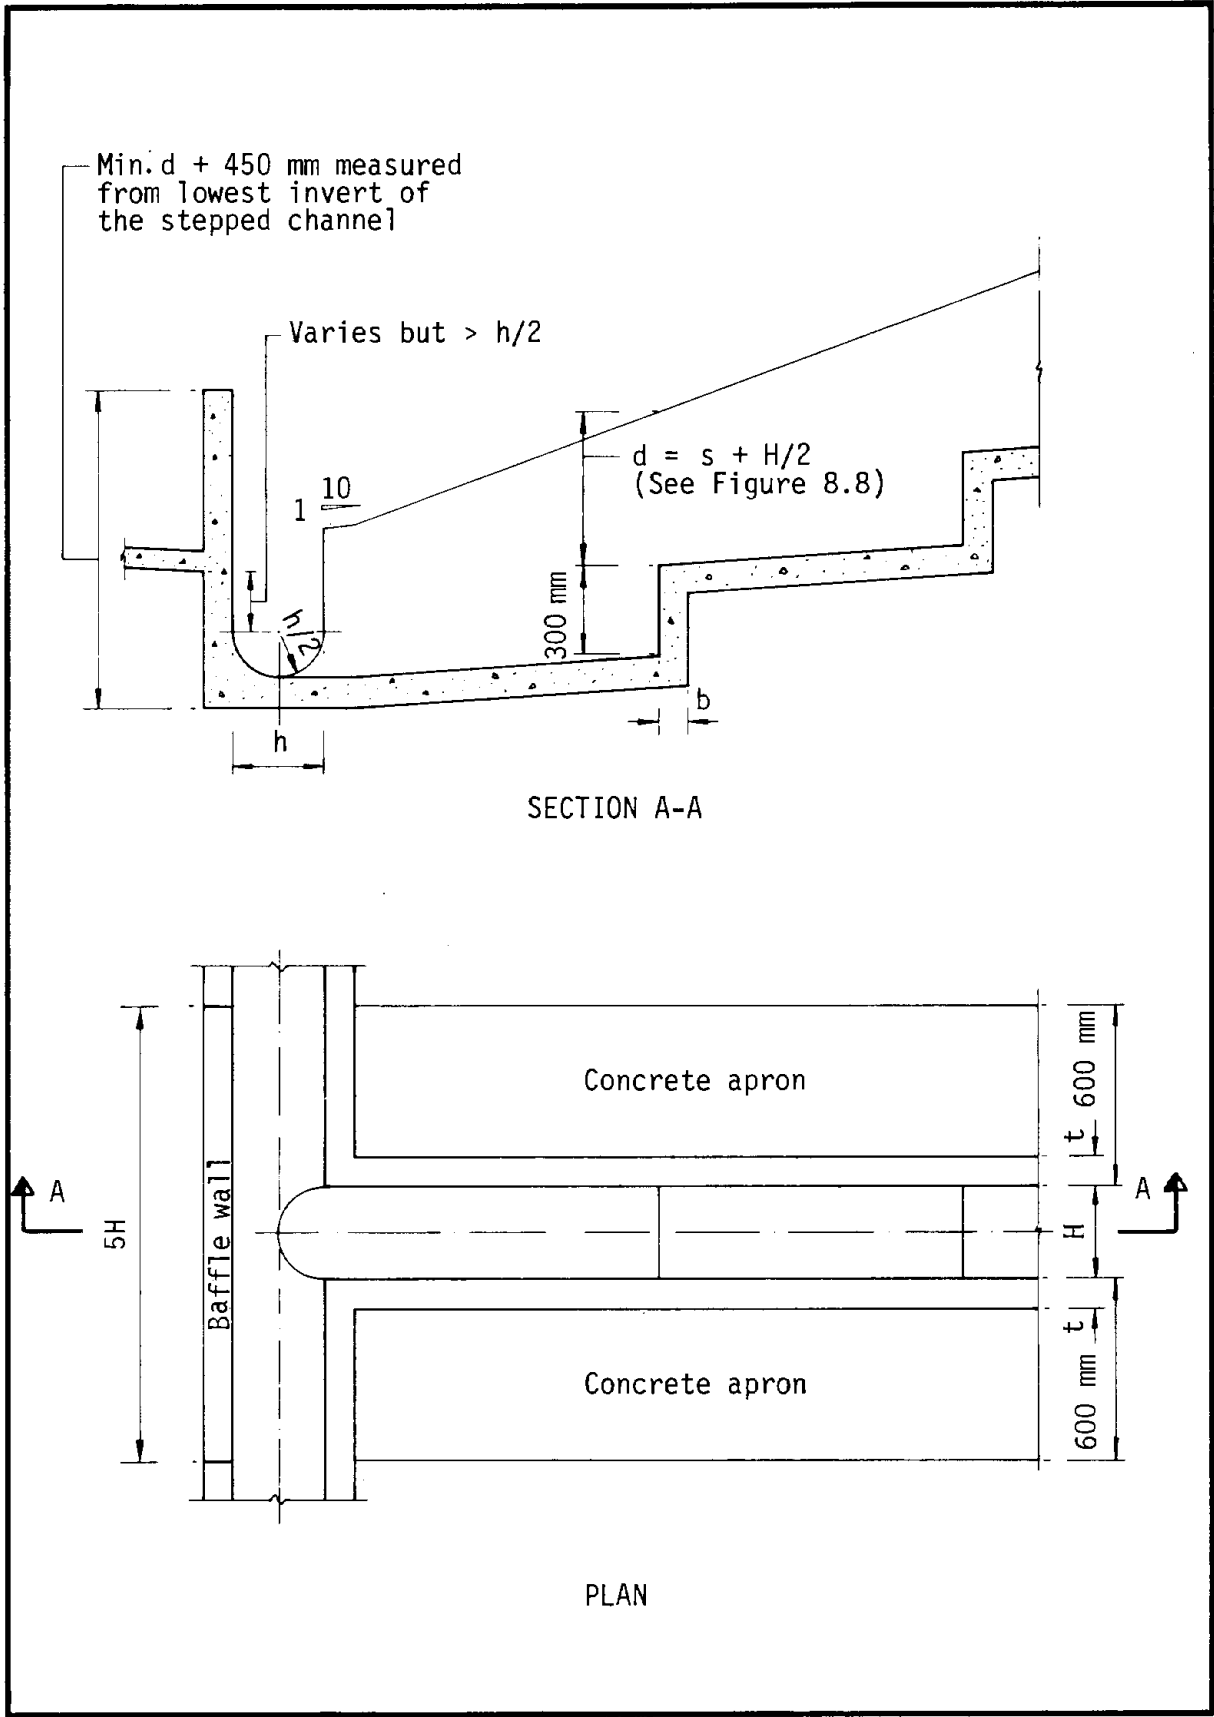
Typical Details of Junction of Stepped Channel and U-channel at Toe of Slope
